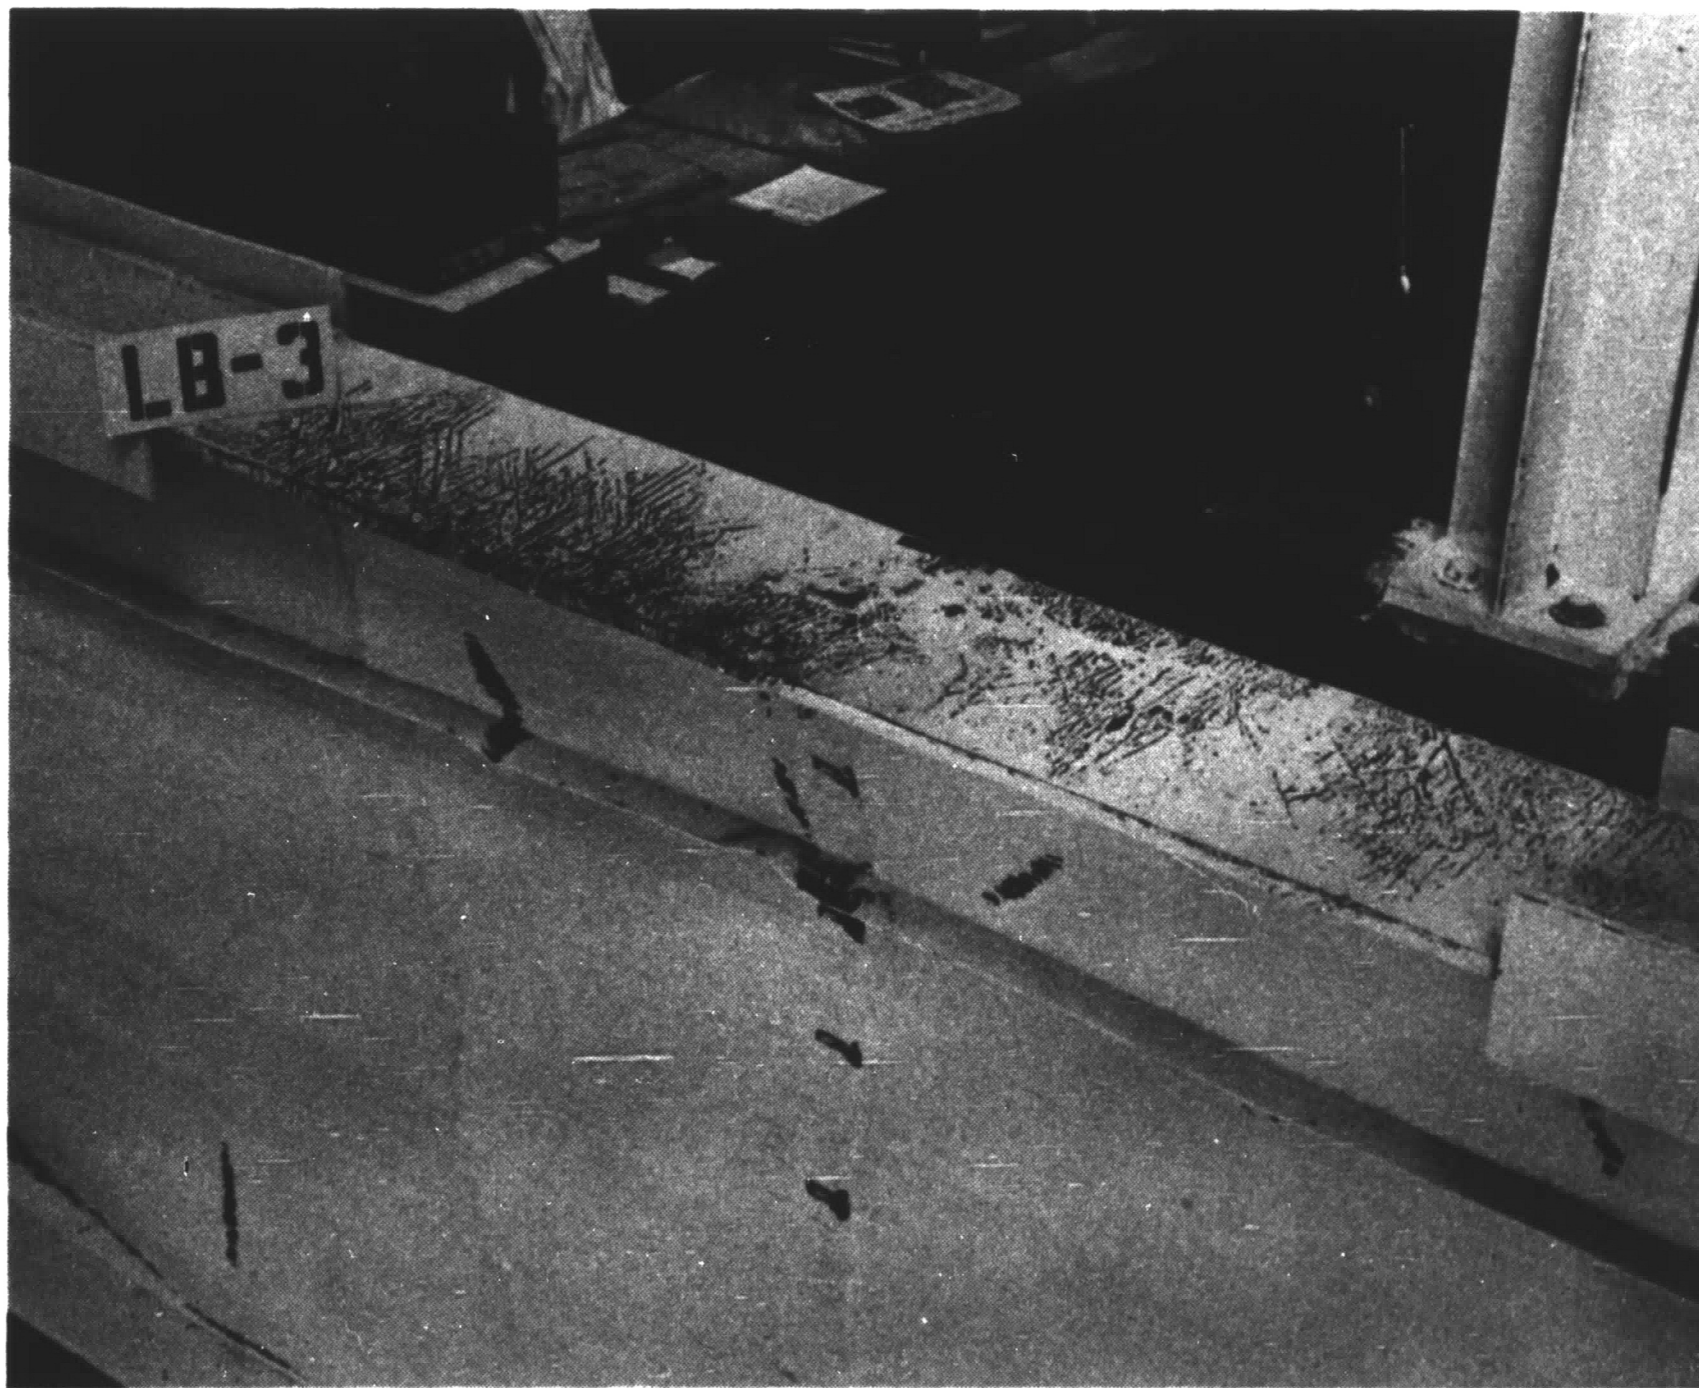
Compression Flange Yield Pattern (Specimen LB3)
